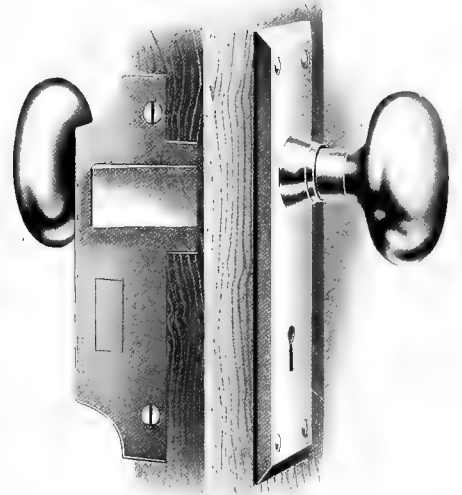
Rim Knob Lock. Russell & Erwin Manufacturing Company.
